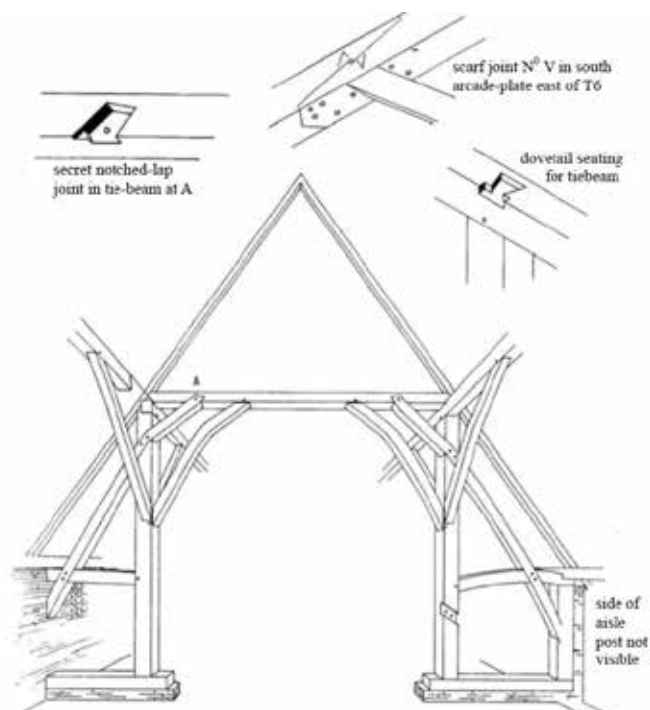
Hall Farm Barn. Partial Reconstruction of Truss 6 (none of the original roof survives)
